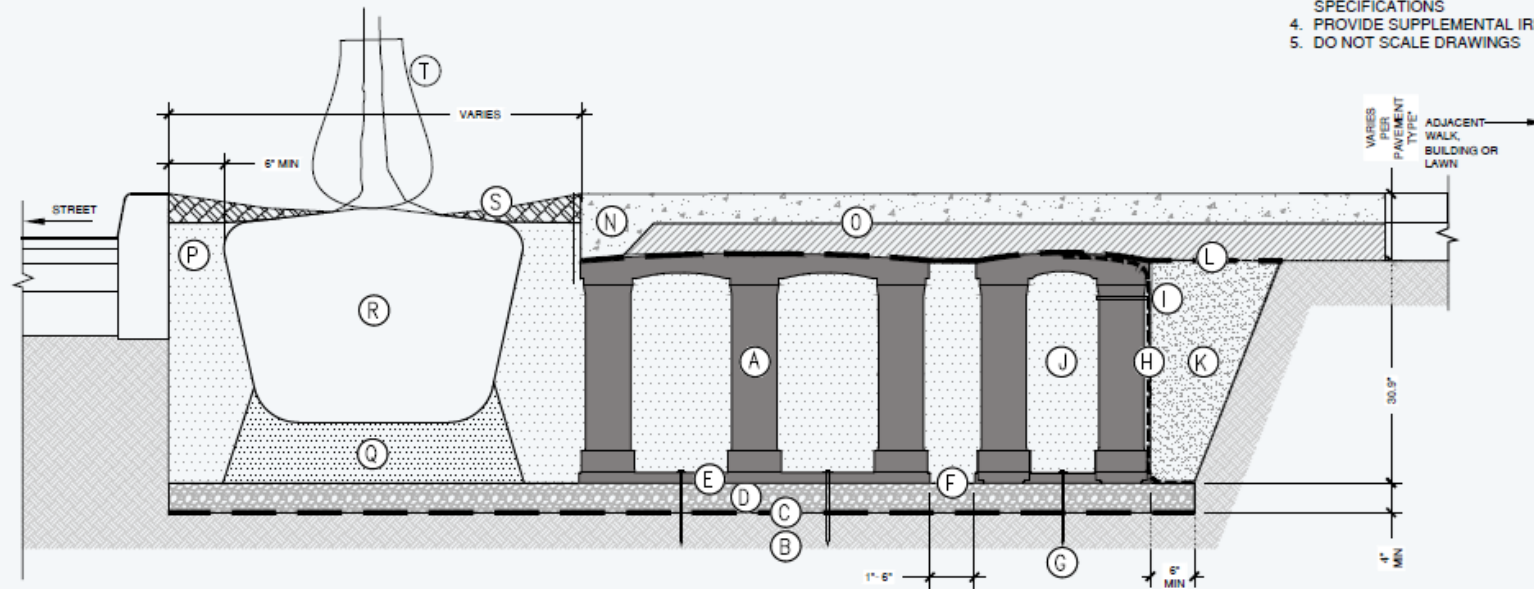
Recommended specifications for planting with adjacent structural cells under walkways
